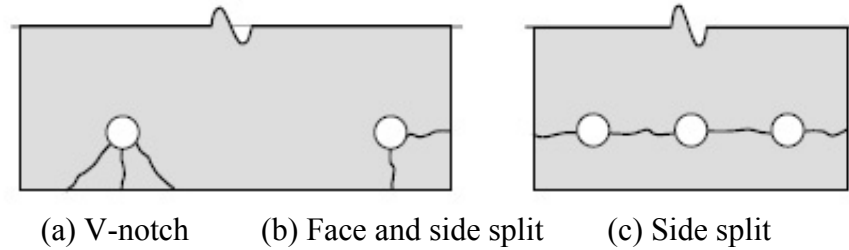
Pullout failure (ACI Committee 408 2003)
